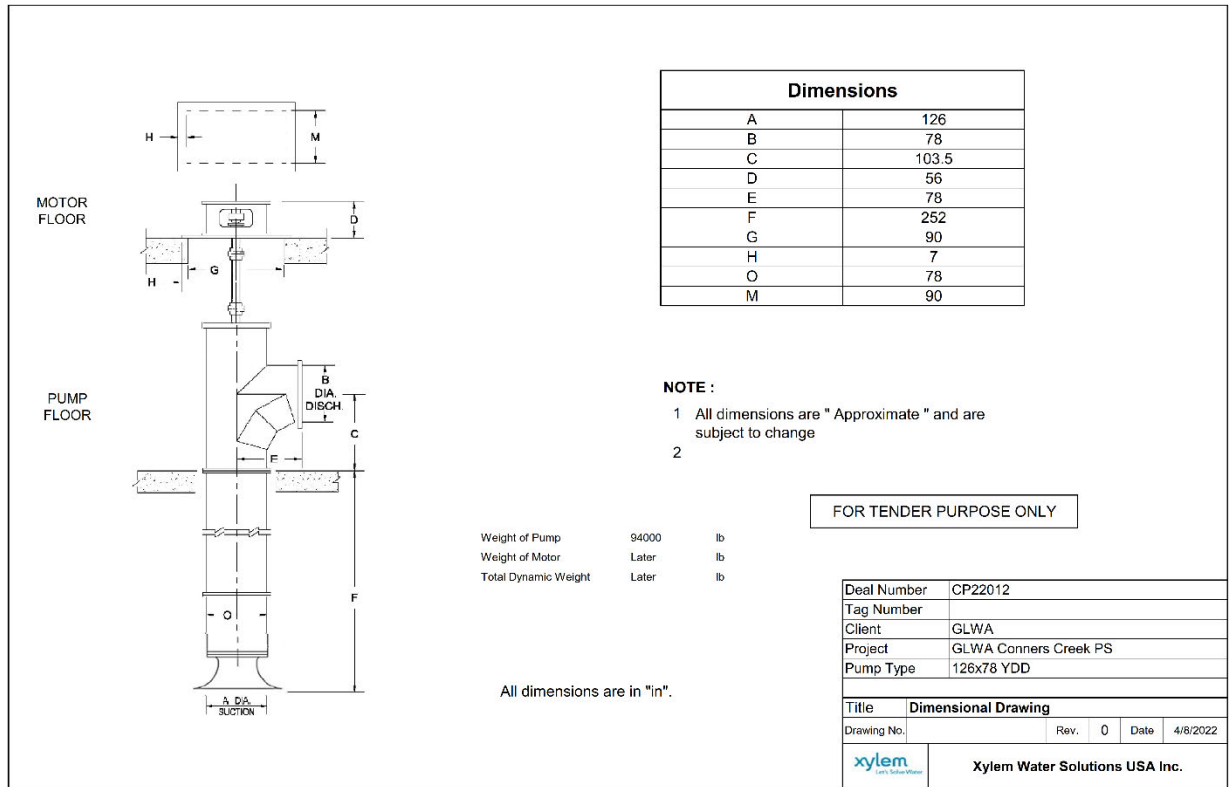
General Pump Dimension Demonstrating Fit Through Existing Holes
